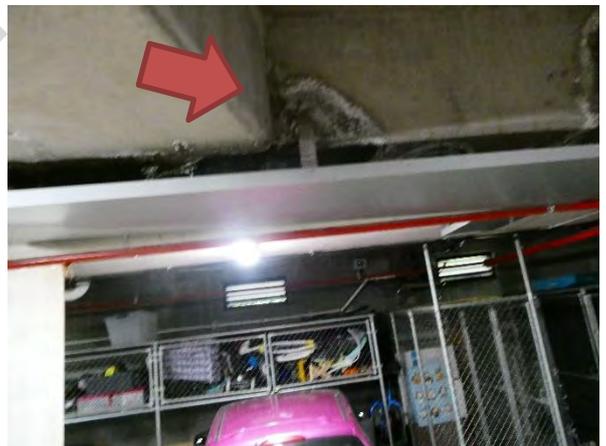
Stainless steel drip trays installed to capture salt laden moisture entering the basement.
